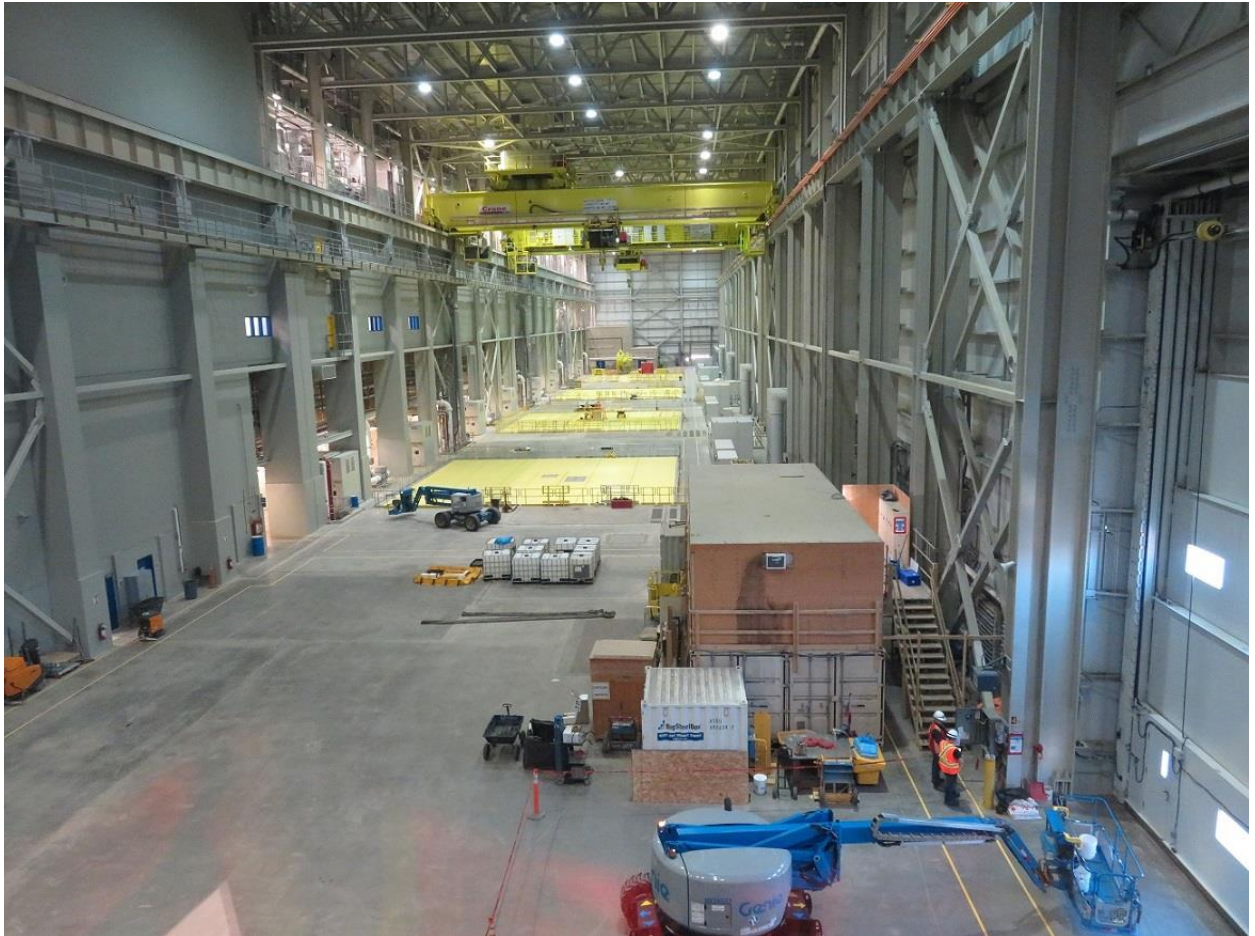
Muskrat Falls powerhouse generator floor viewed from control room.
